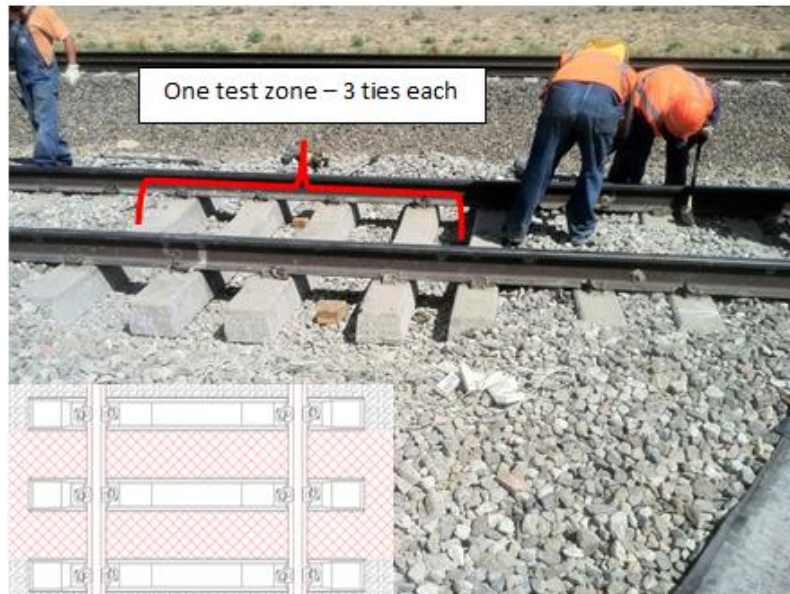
Schematic of ballast excavation from the cribs of each test zone
